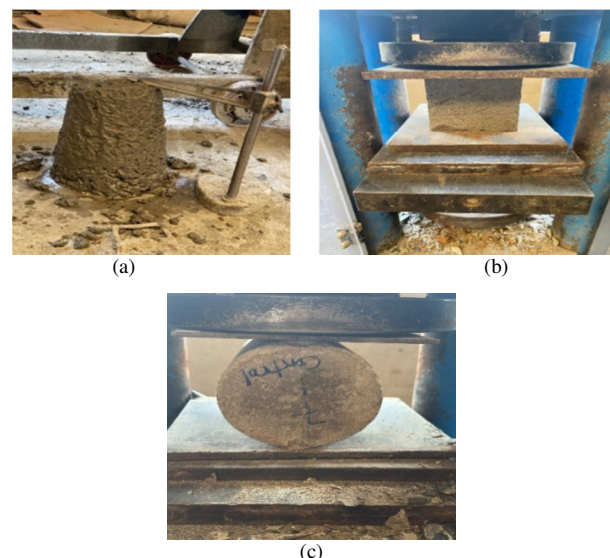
(a) Workability test, (b) compressive strength test, and (c) split tensile strength test on concrete.
